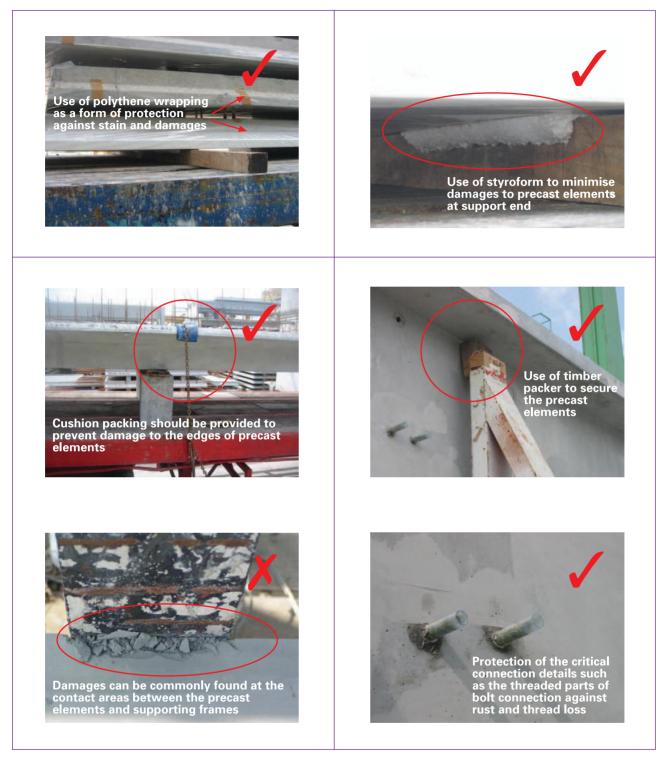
Protection measures such as the use of cushion packing or polythene wrapping can be used to minimise damages to precast concrete elements.
